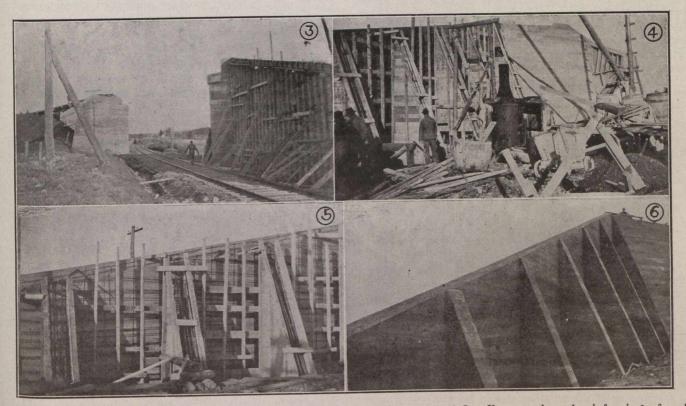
Abutments in place on either side of the C.P.R.line. Figs. 4 and 5.—Formwork and reinforcing of wall ready for concrete. Fig. 6.—Completed wall from counterfort side.
